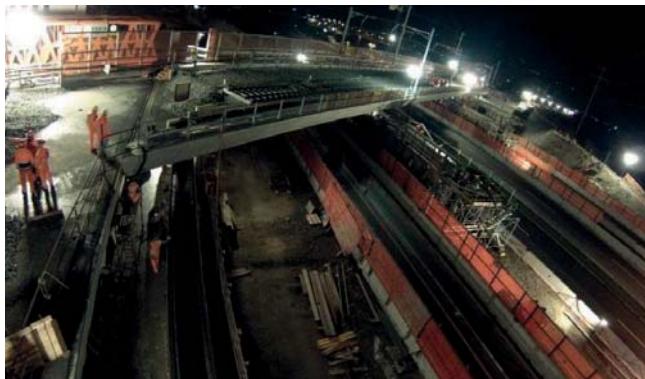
While the railway technology works were ongoing adjacent to the railway bridge, operations were carried out to connect the new track in the south and north. The photo shows activities in progress on the embankment next to the railway bridge, from left to right: planimetric siting of new track 300 EML 630 using a ballast tamping machine; scattering the first layer of ballast on the route of the future track 400 EML630 (using a double track excavator); using an excavation train to remove ballast no longer required and servicing the decommissioned tracks 300 and 400 (provisional EML630).
